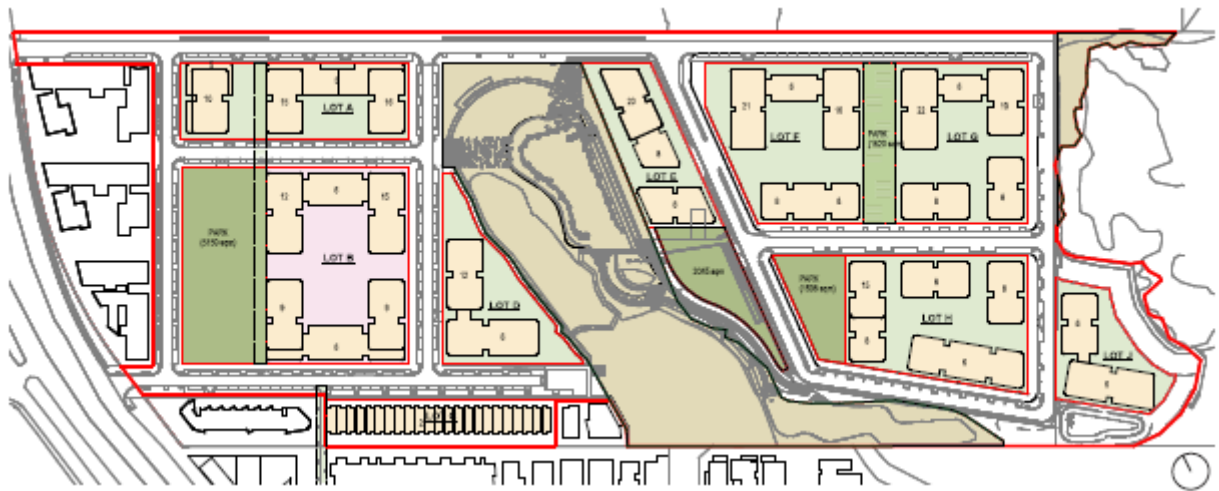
Original masterplan - indicative land use (Source: SJB)
